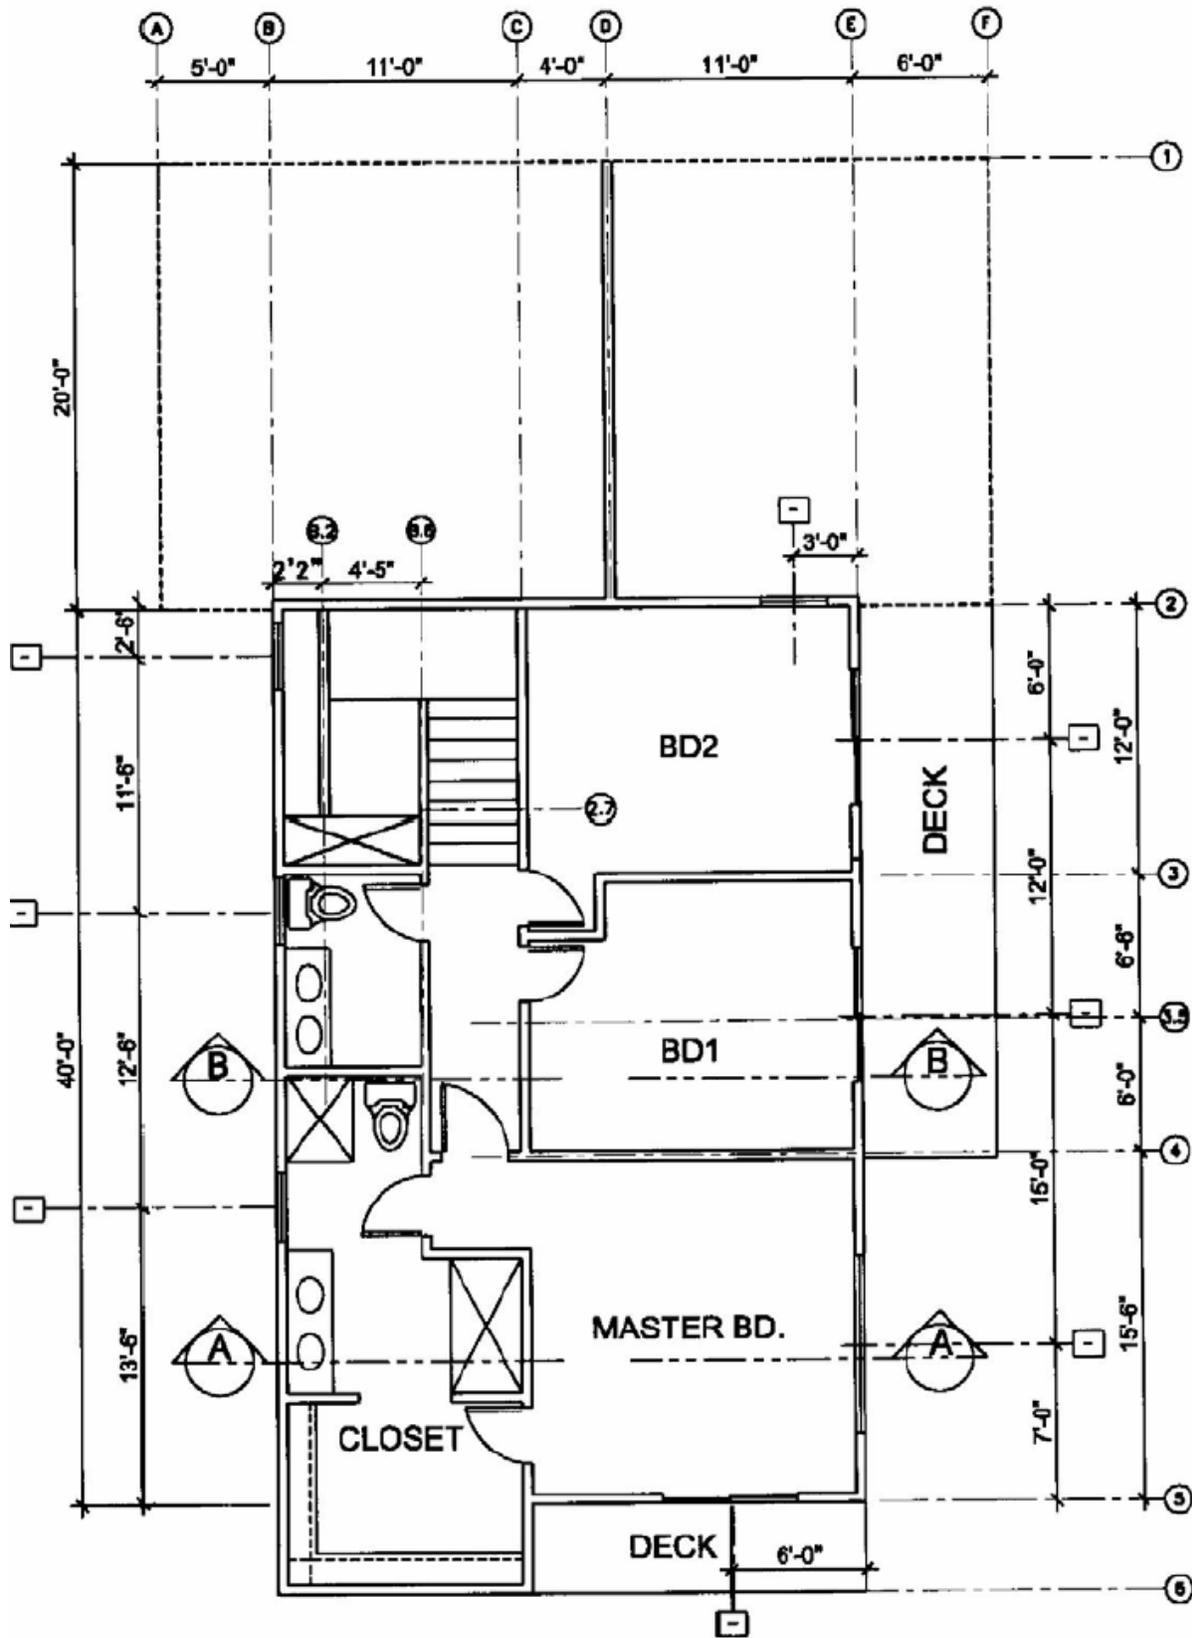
Index building 4 second-floor plan (sheet A1, right)
